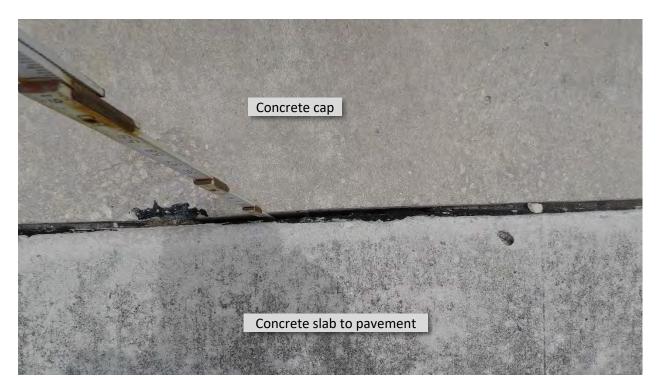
STA 6+20. Depth of void measurement. Top view of the gap between seawall cap and concrete slab to sidewalk.
